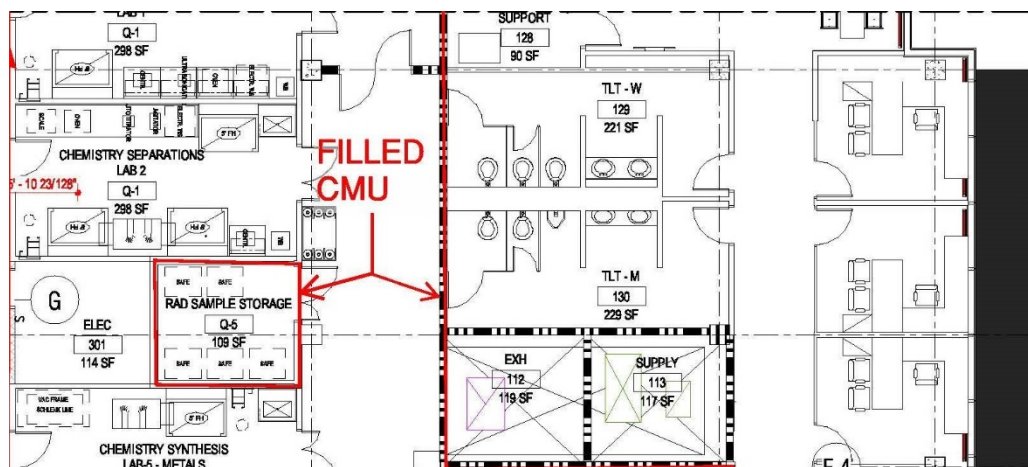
MDL Rad Lab 50% design plan view showing the Electrical Closet, Rad Storage Room, and restrooms with grouted CMU. Note: Grouted CMU was specified later for the walls of the Electrical Closet adjacent to hoods and glove boxes.
